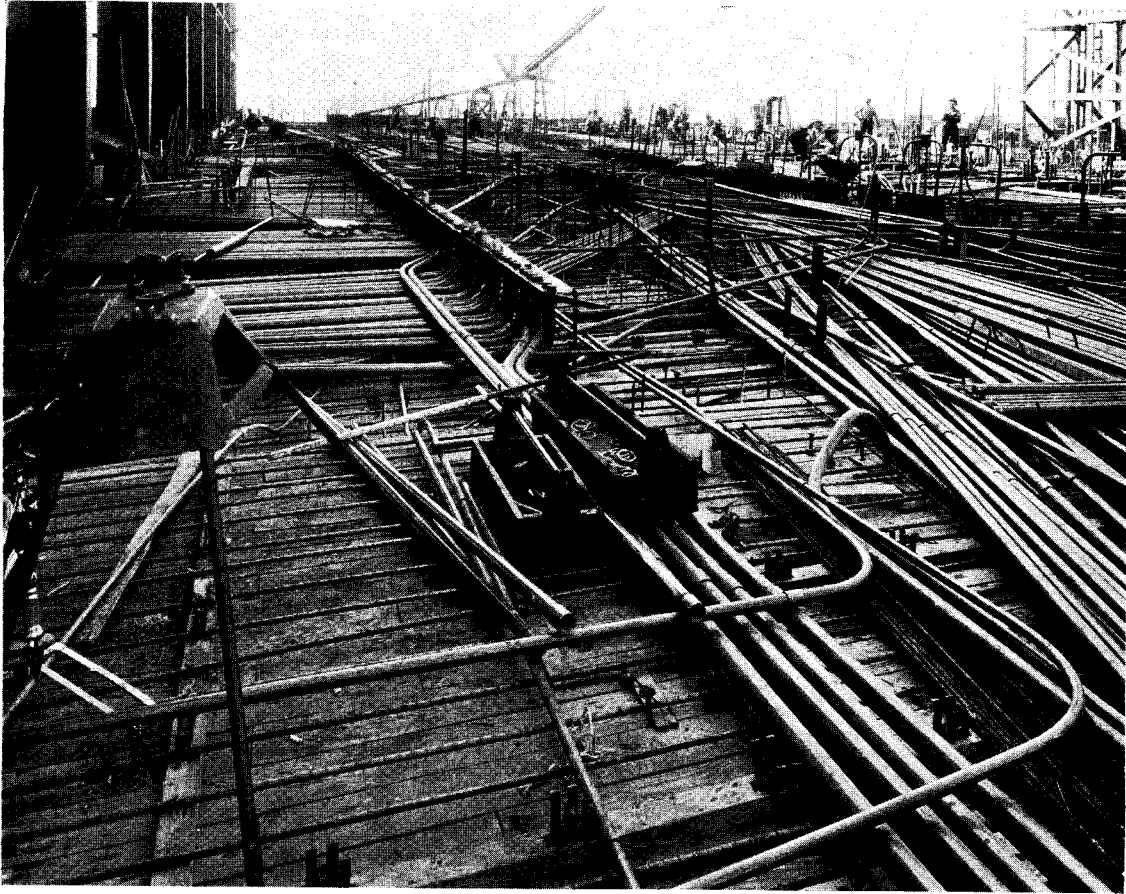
An installation of conduit just before pouring concrete floor. Note particularly the template method of holding conduits in position.
